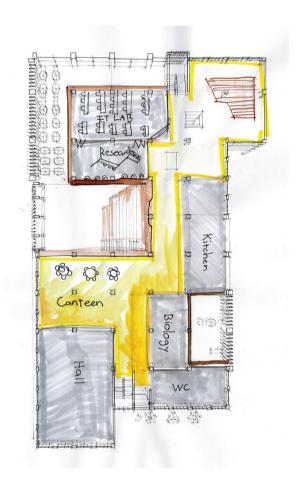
Conceptual Fourth Floor Plan, August 2016
